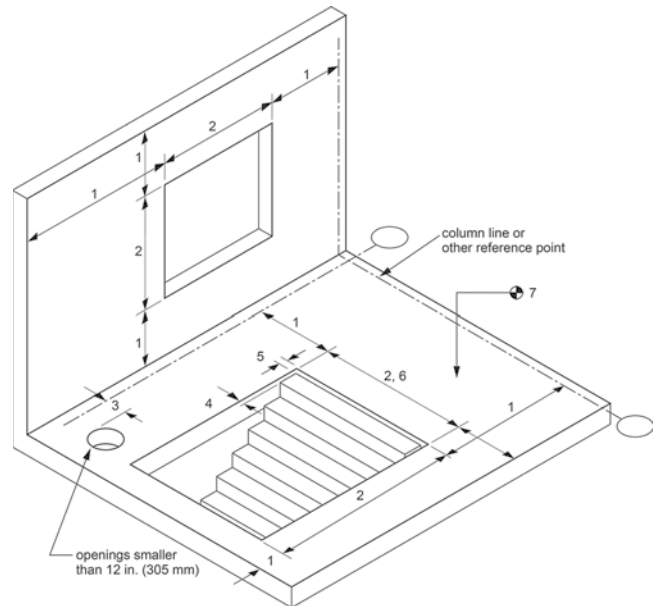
Tolerances for concrete openings (Fig. 5.3.1.1.1 in ACI 117.1R-14)²
